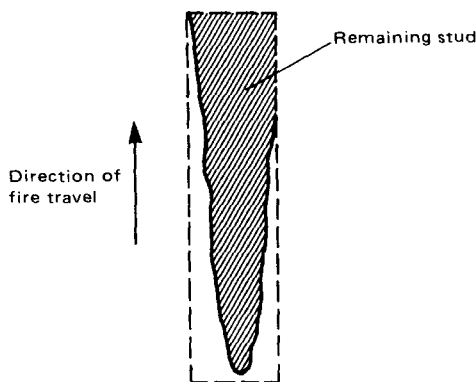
(b) Cross section of wood wall stud pointing toward fire.
